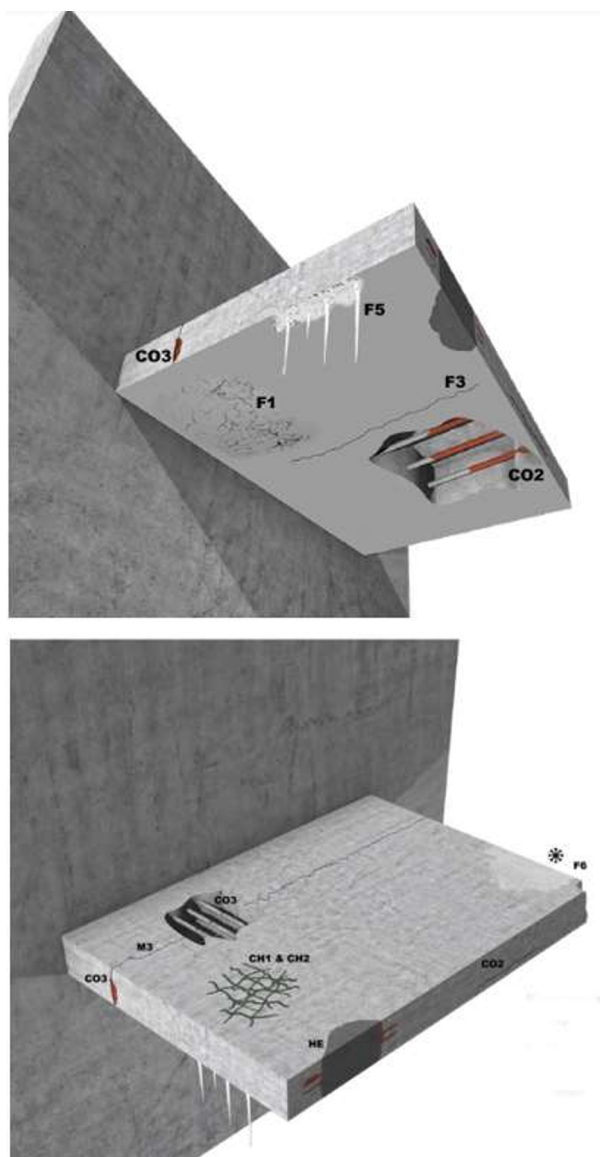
Render of typical observed damage on cantilevered RC balconies.
